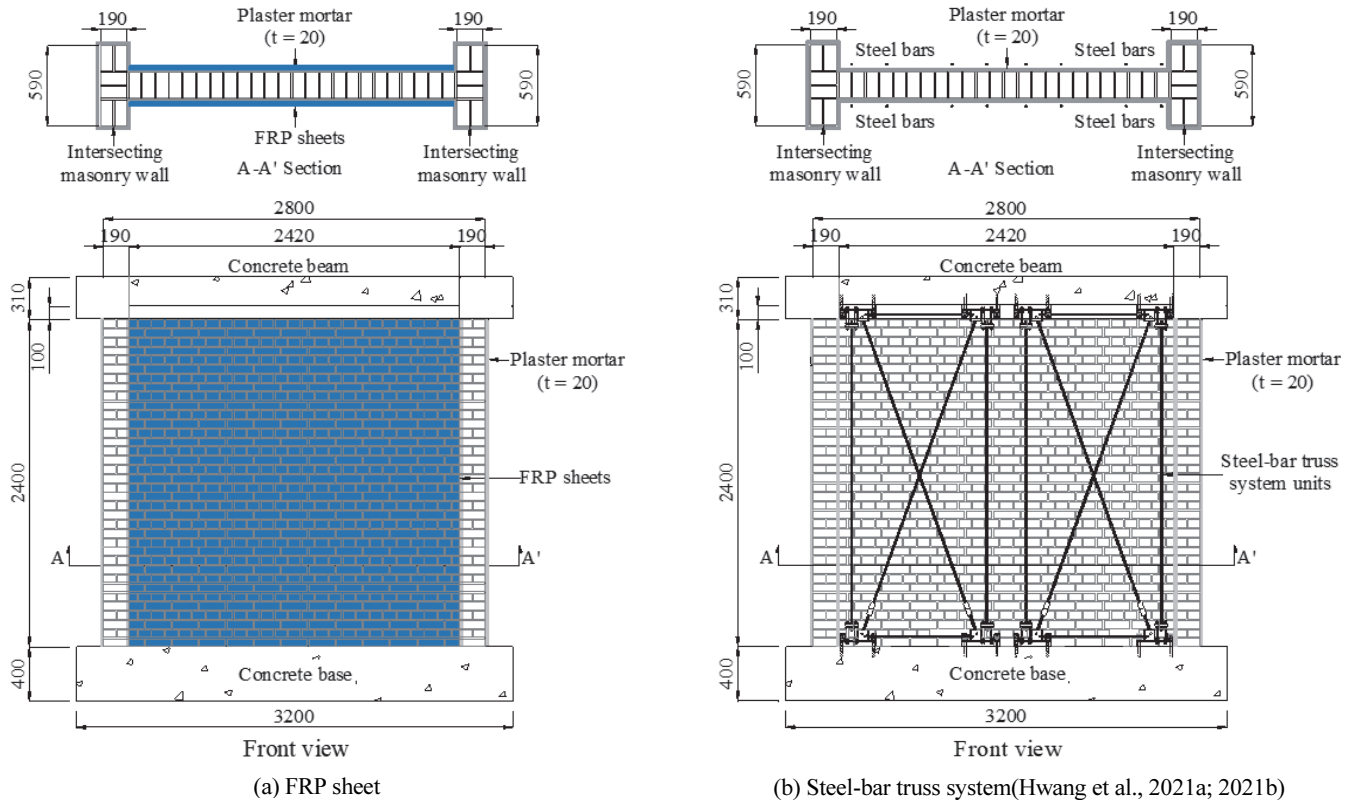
Specimen details and arrangement of reinforcement(all dimensions are in mm)
